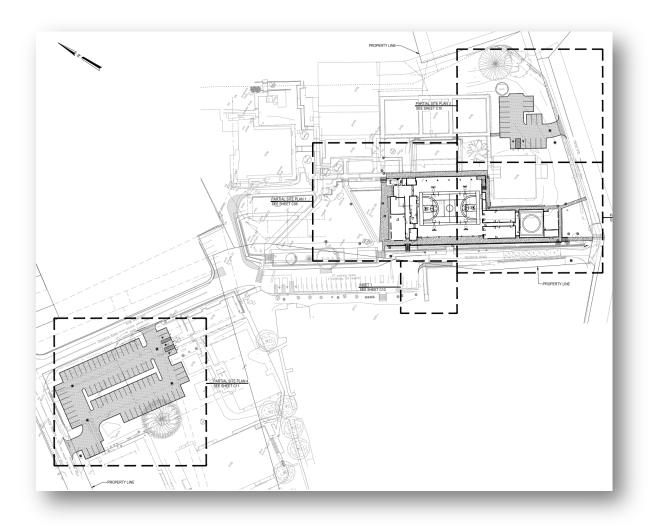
New Parking Lots Plan Source: Design Partners Incorporated
